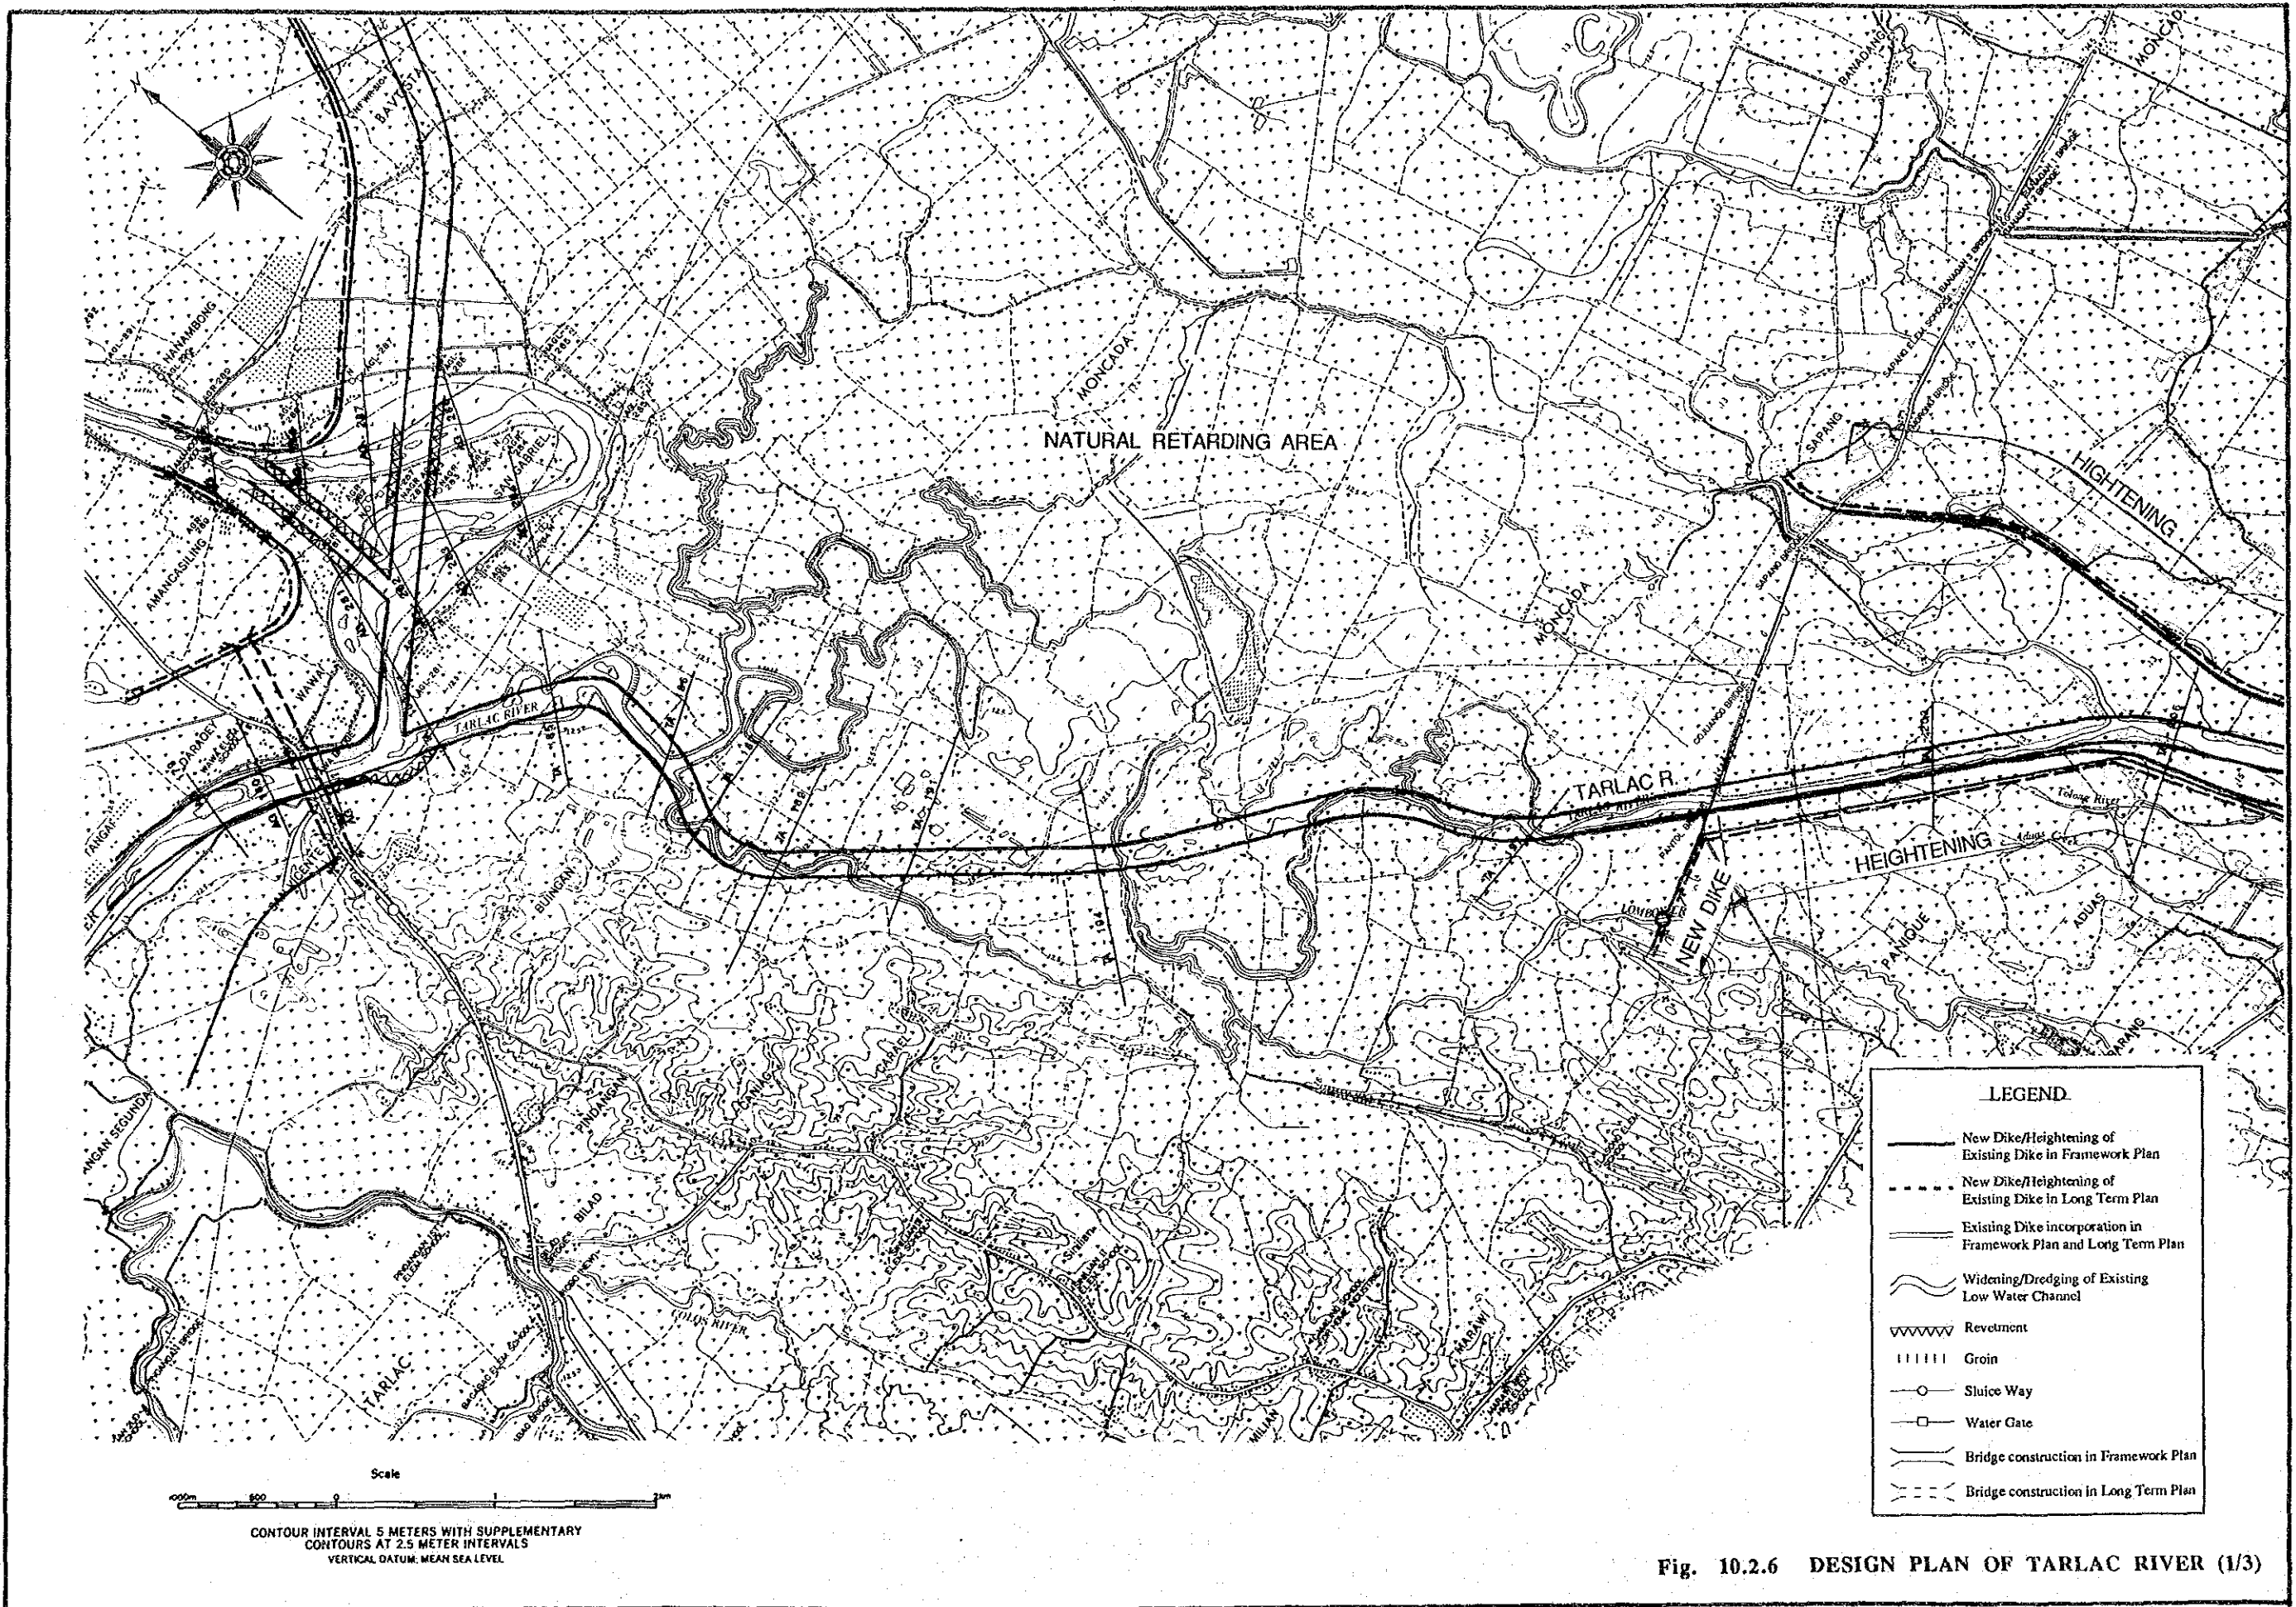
DESIGN PLAN OF TARLAC RIVER (1/3)
